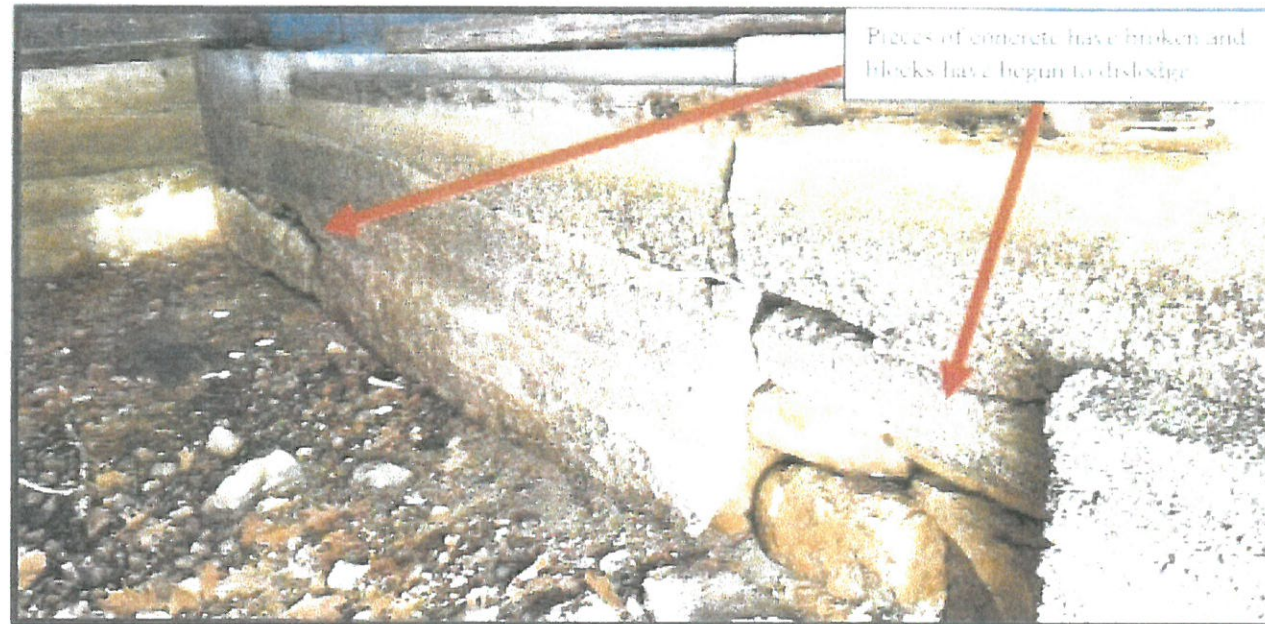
This is a view of the interior of the existing basin during lake drawdown, where concrete and blocks have begun to crack or dislodge
